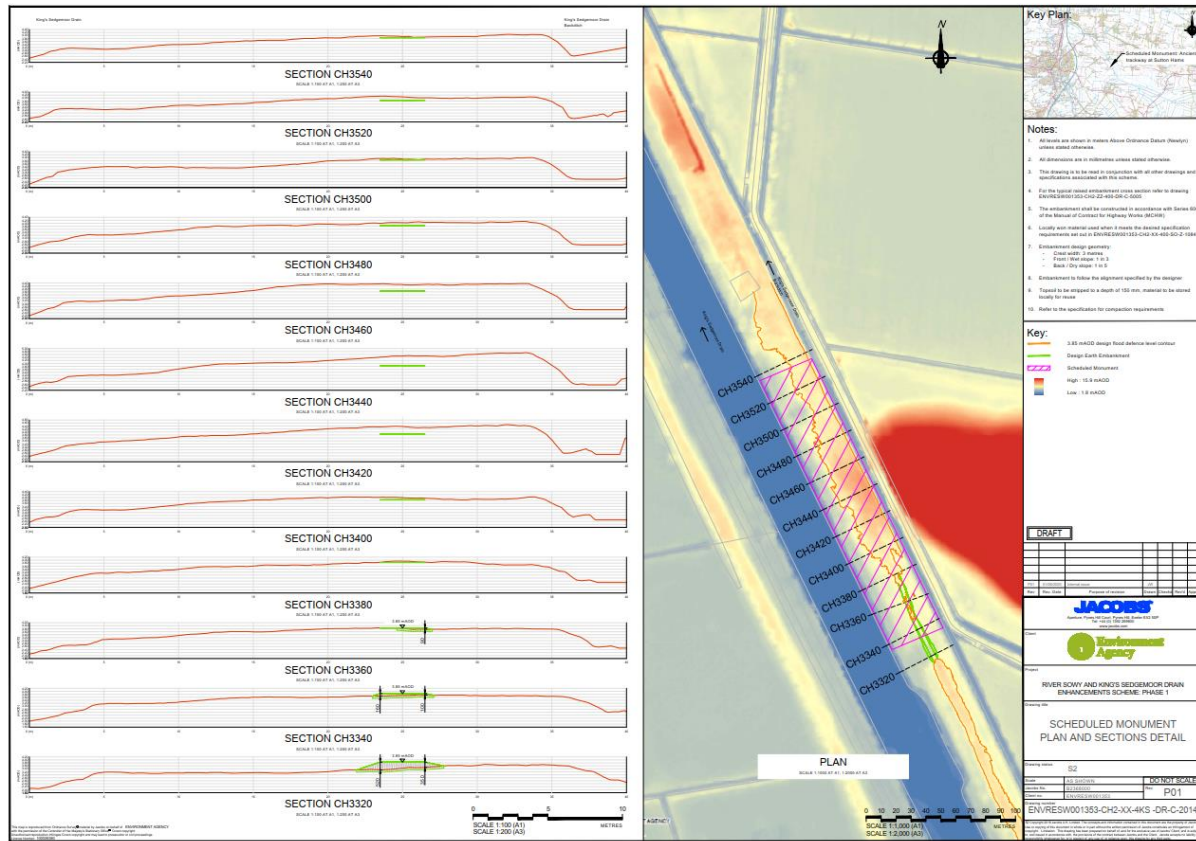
Plan and Section detail. Area of Timber track shown with pink line in plan view (i.e. extending from CH3340-CH3540)
